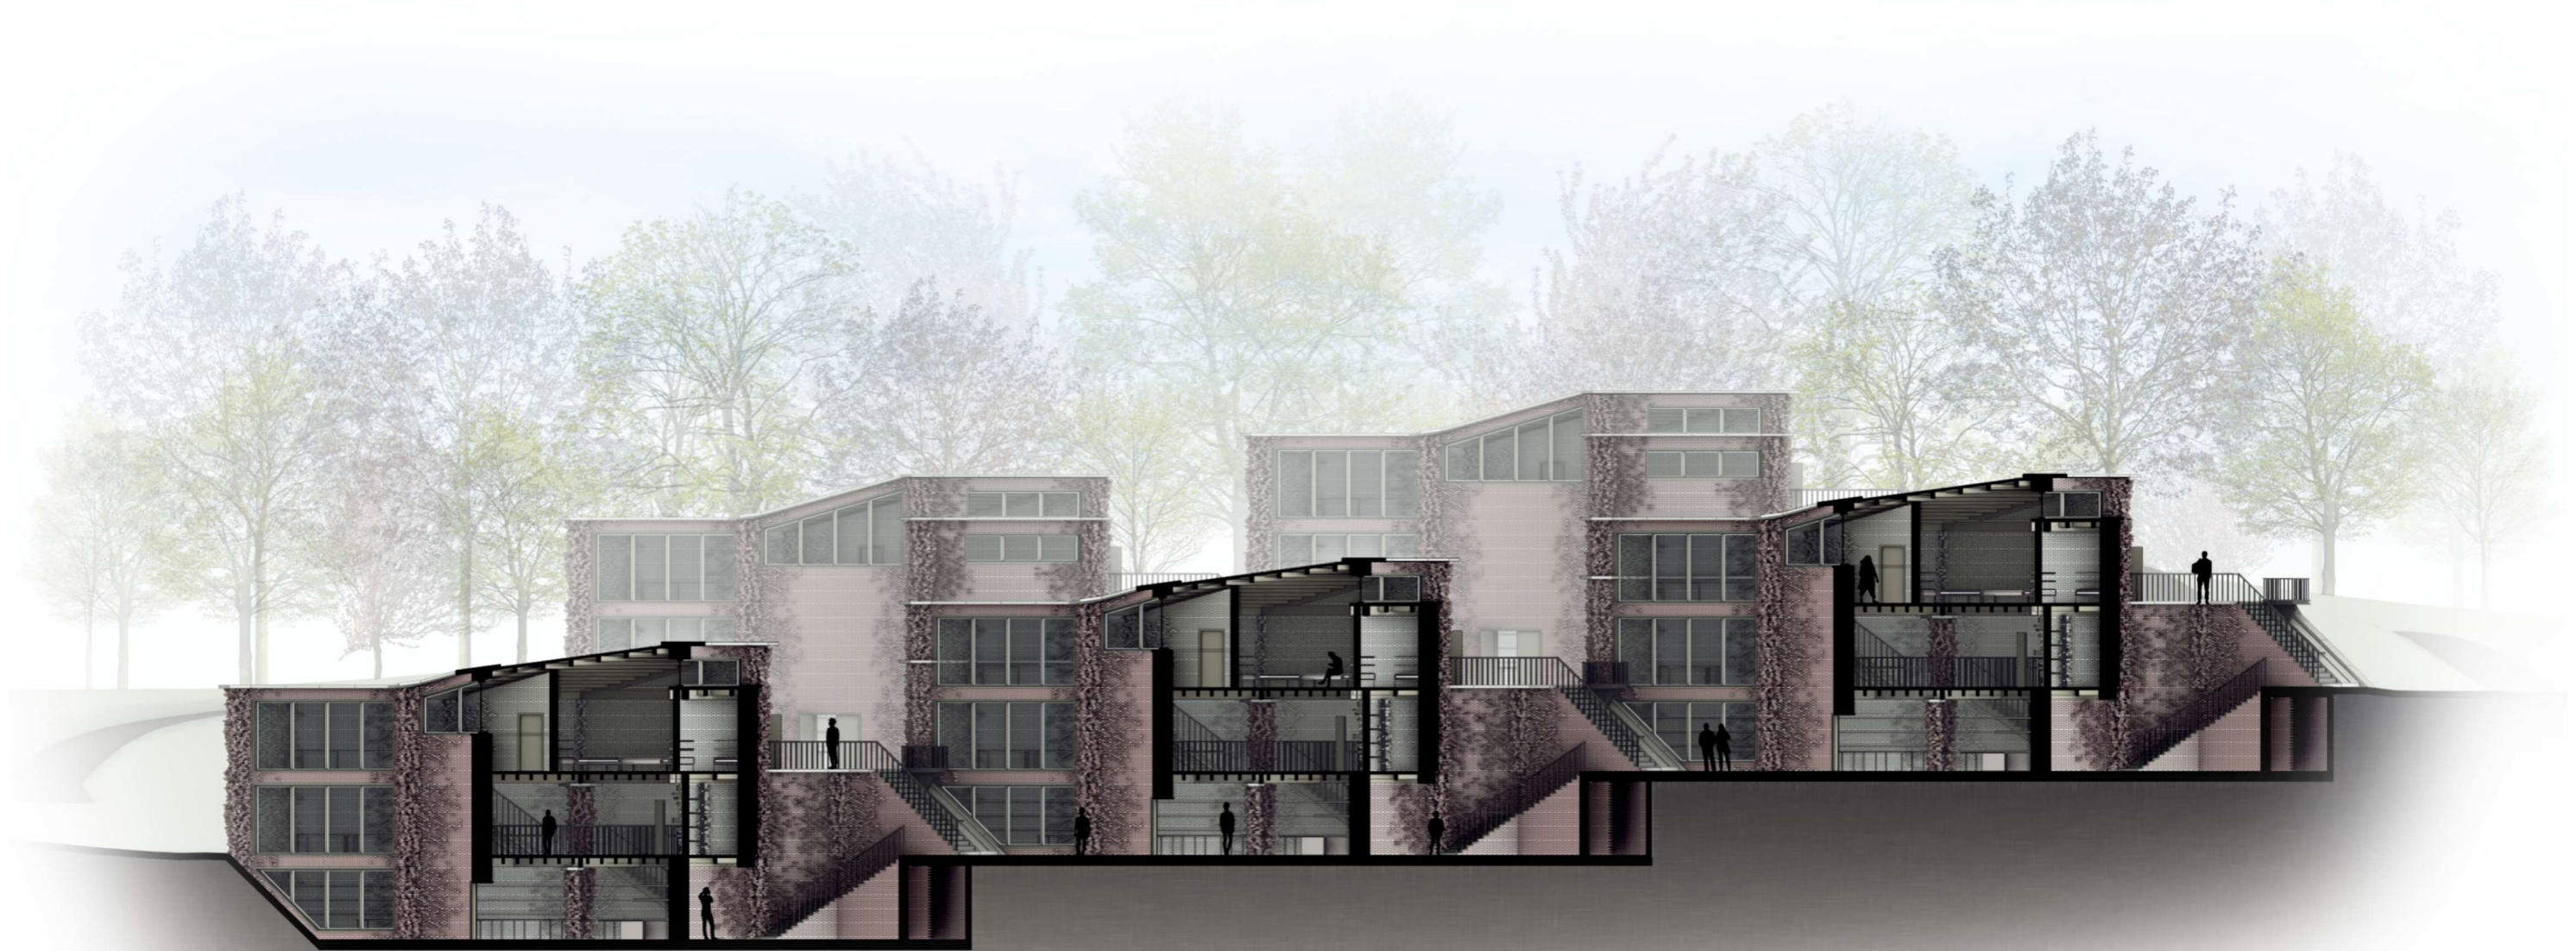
// Final Design - Proposed Live / Work Spaces Section
